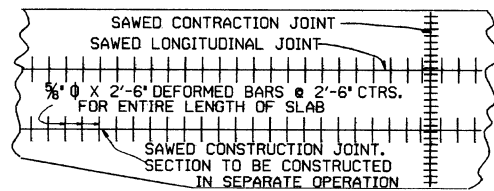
DETAIL OF SAWS LONGITUDINAL JOINT AND LONGITUDINAL CONSTRUCTION JOINT
